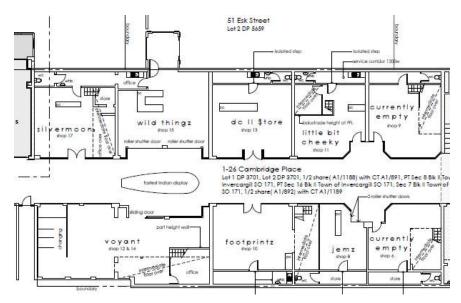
Building Floor Plan from 2010 drawing by Design Base Ltd.
